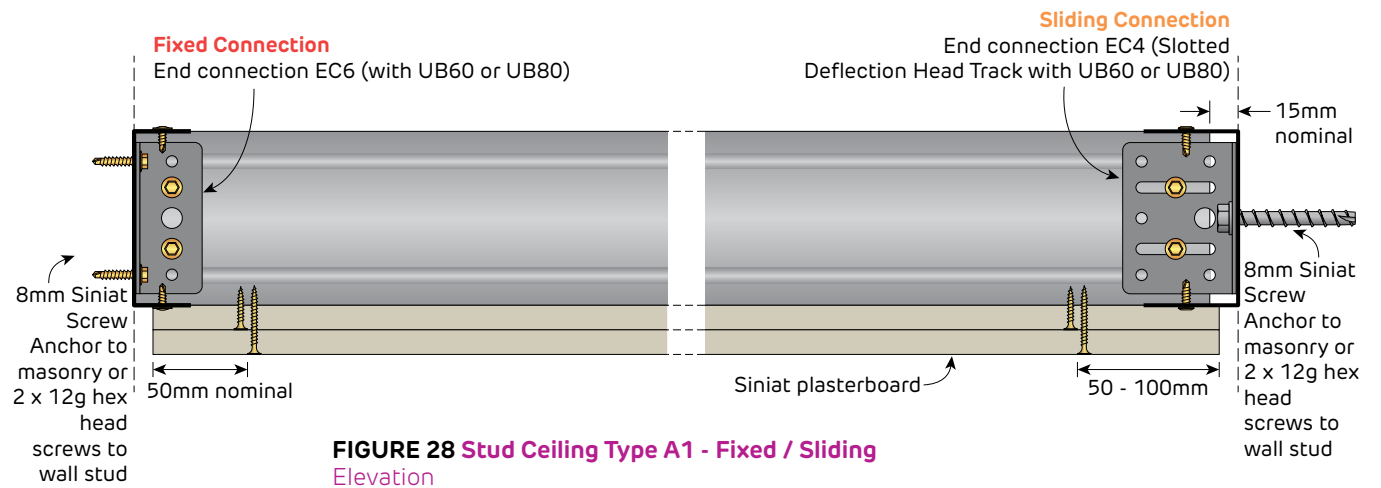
Stud Ceiling Type A1 - Fixed / Sliding
